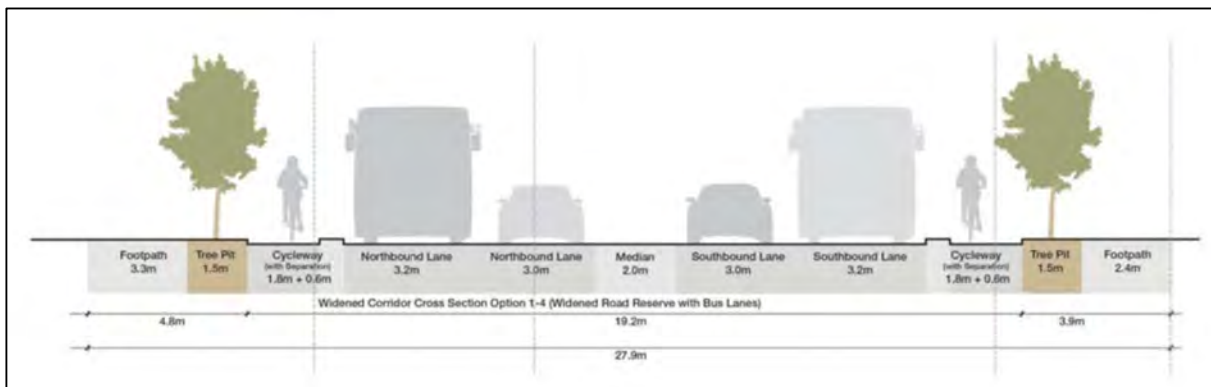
Carrington Road Upgrade mid-block cross-section
